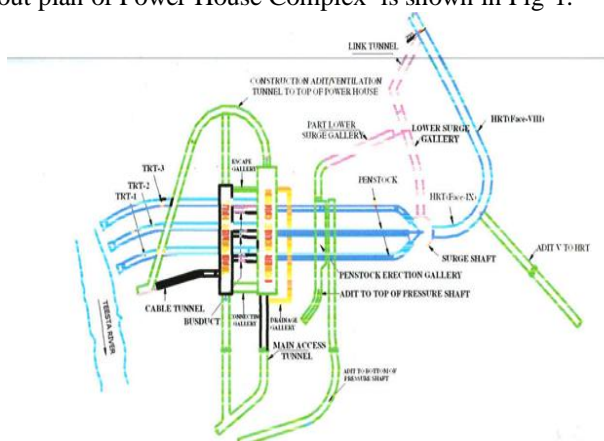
LAYOUT PLAN OF POWER HOUSE
